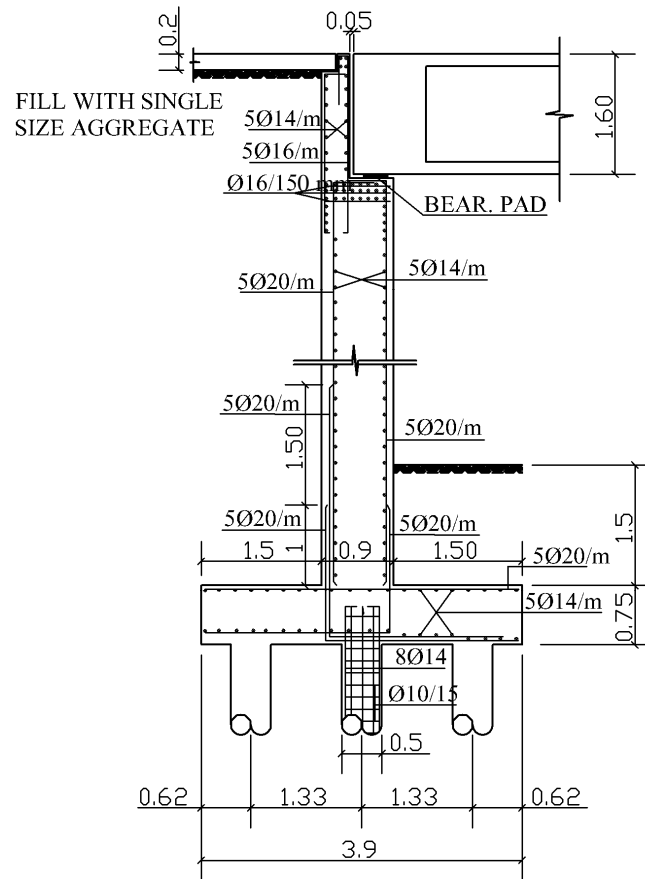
Alnasha Bridge Abutment #2 details (Dimensions in meter).
